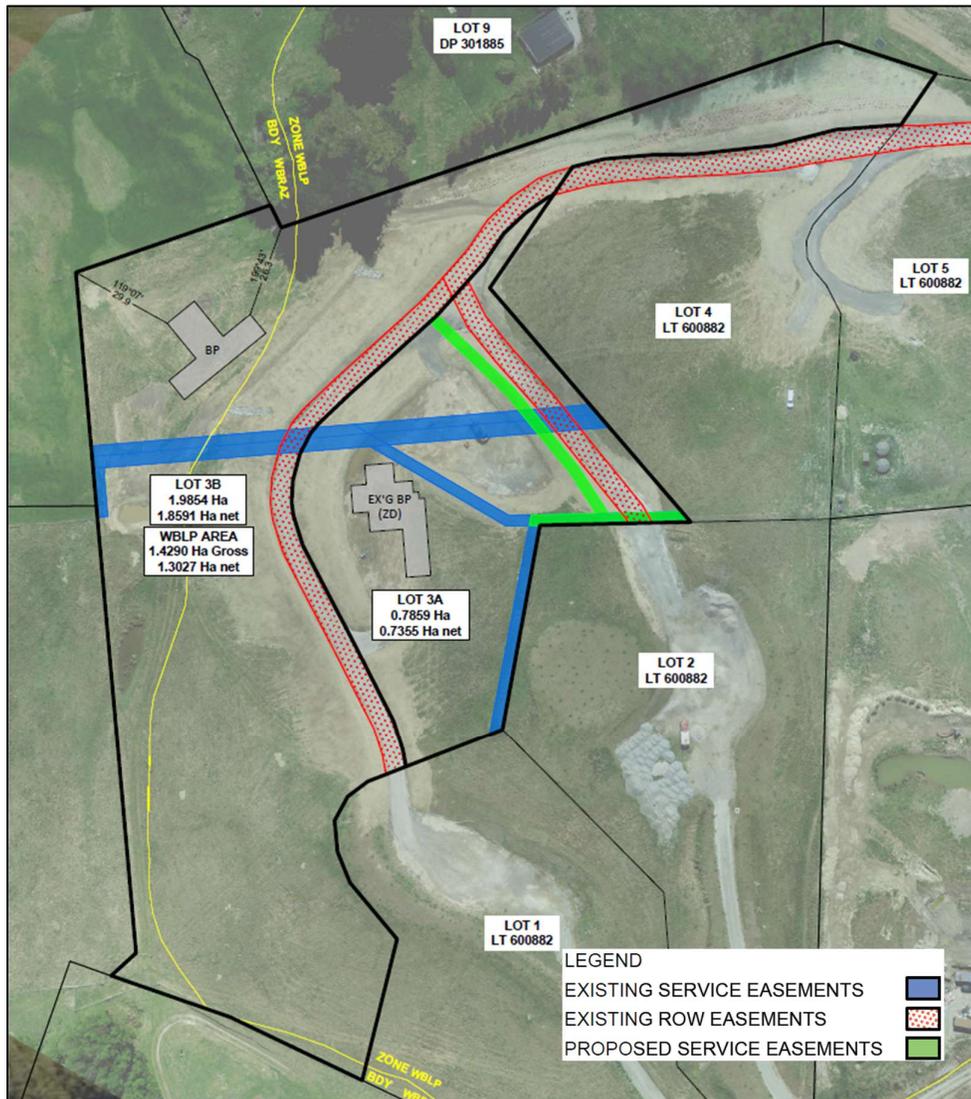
Snip of proposed scheme plan for the subdivision of 77 Frogmore Lane (Lot 3 DP 600882). New ROW easements will be established to protect existing access arrangements.
